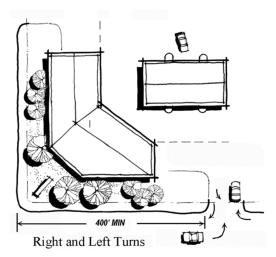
DRIVEWAY DISTANCE FROM INTERSECTION
